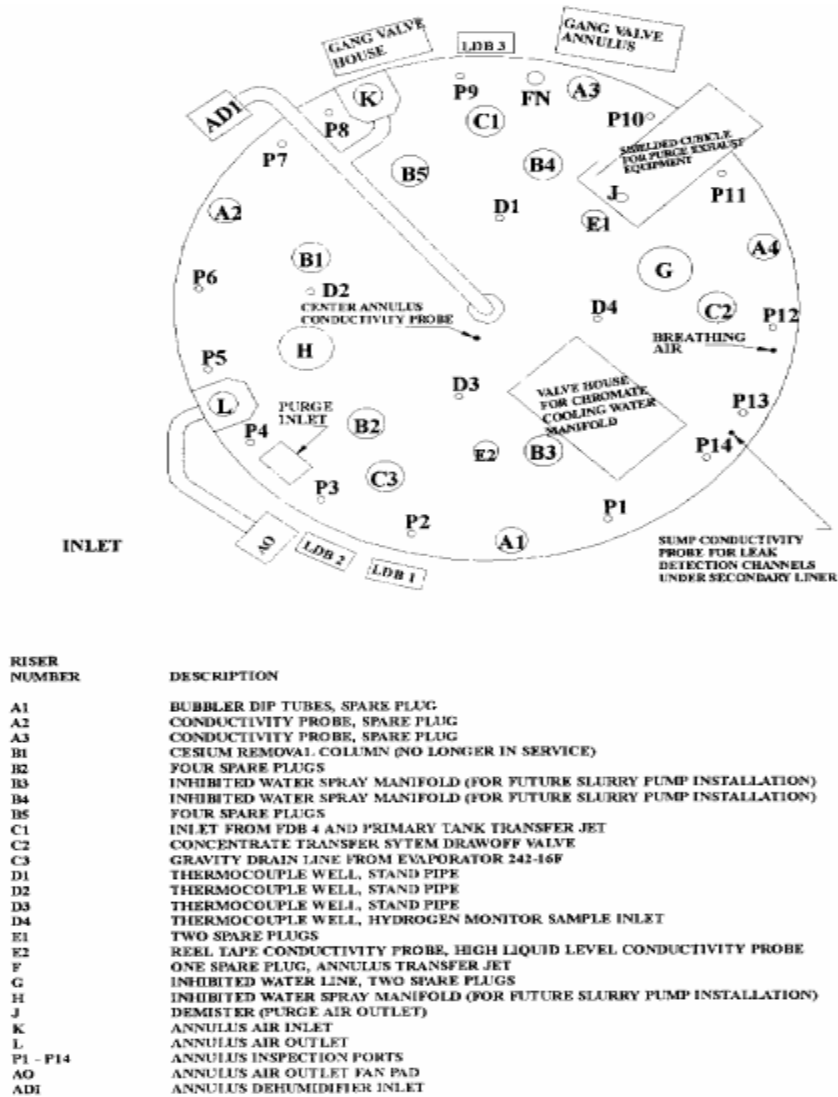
Tank 25 Risers Arrangement (G-SYD-F-00001)
